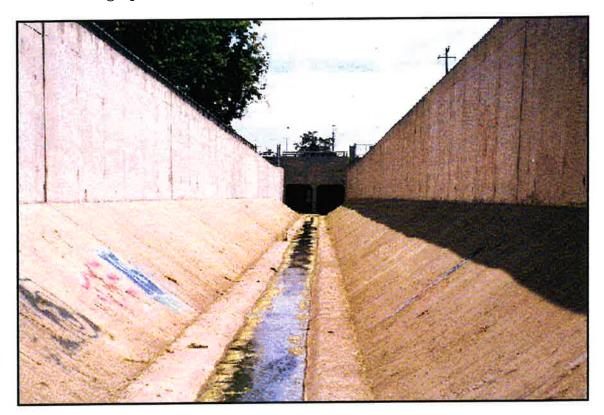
View of the channelization works from station 0+270 looking downstream towards the Plains Road culvert.
